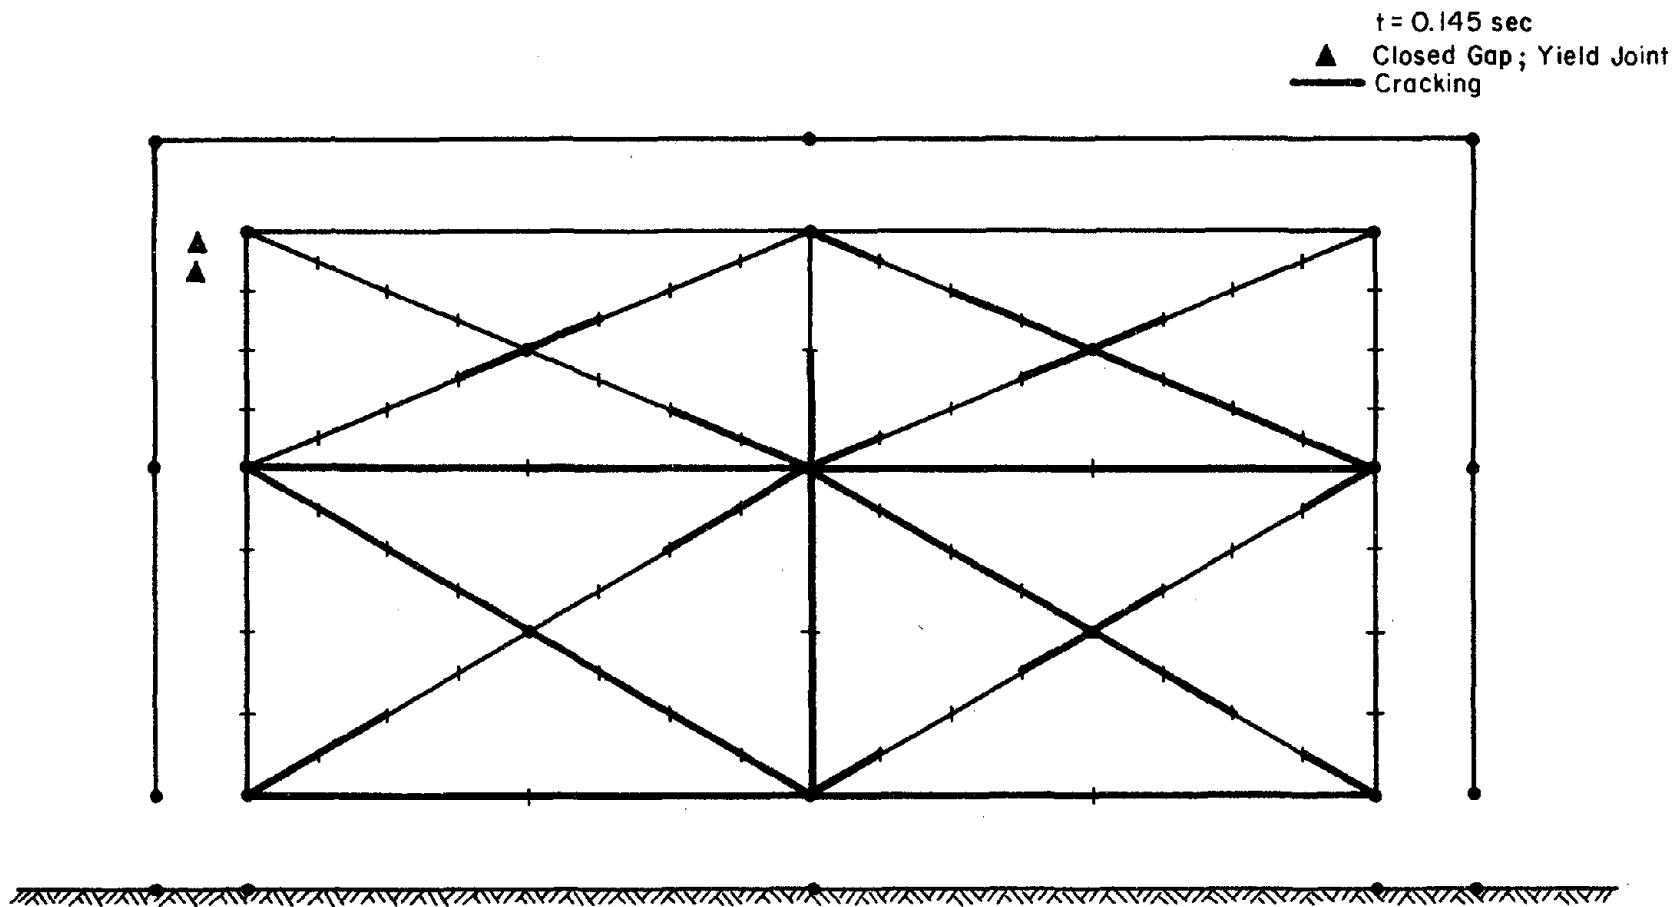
Crack Pattern: Frame Wall-Gaps(II) at t=0.145 sec
